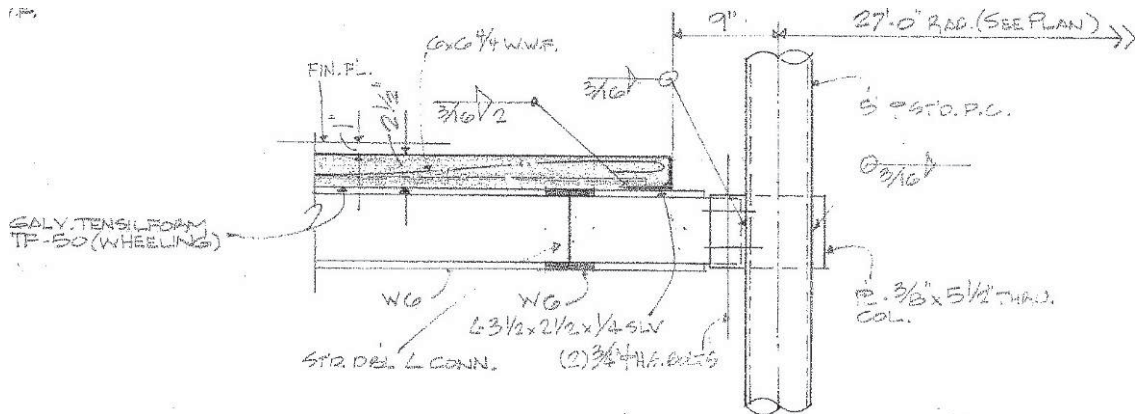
Section X/S.8 from the 1972 Structural drawings shows the connection of the W6 beam in the middle gallery to the column inside the cracked wood casing.
